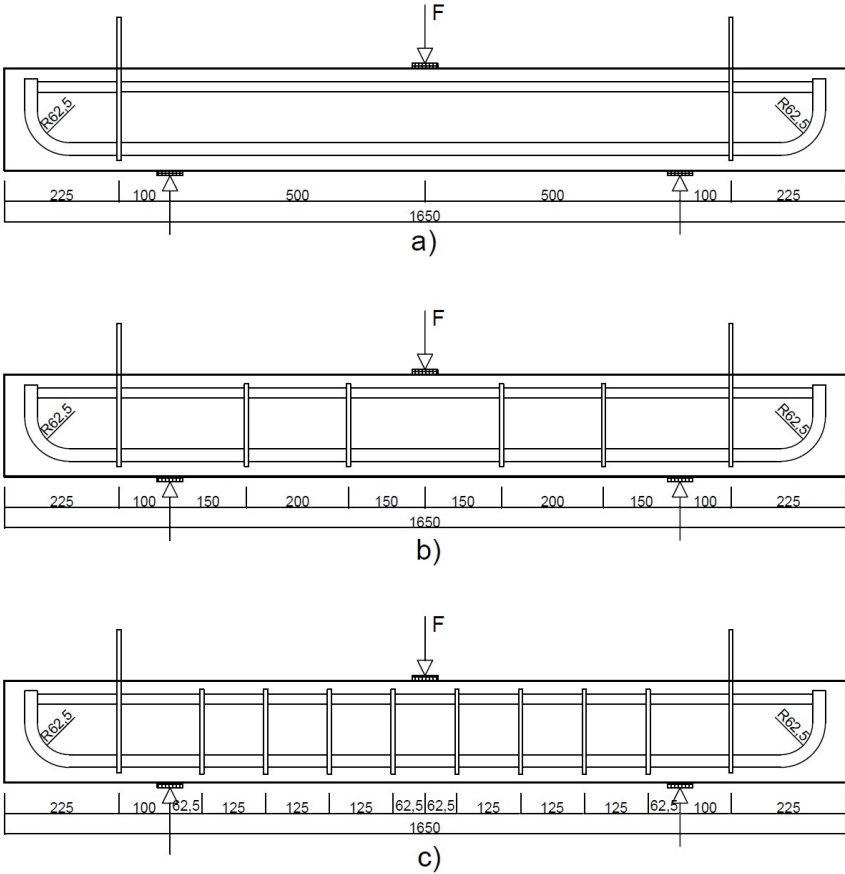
Longitudinal cross-section of beam specimen: a) Beam without stirrups (NS); b) Beams with 4 stirrups (S4, B4 and UD4); c) Beams with 8 stirrups (B8 and UD8)
